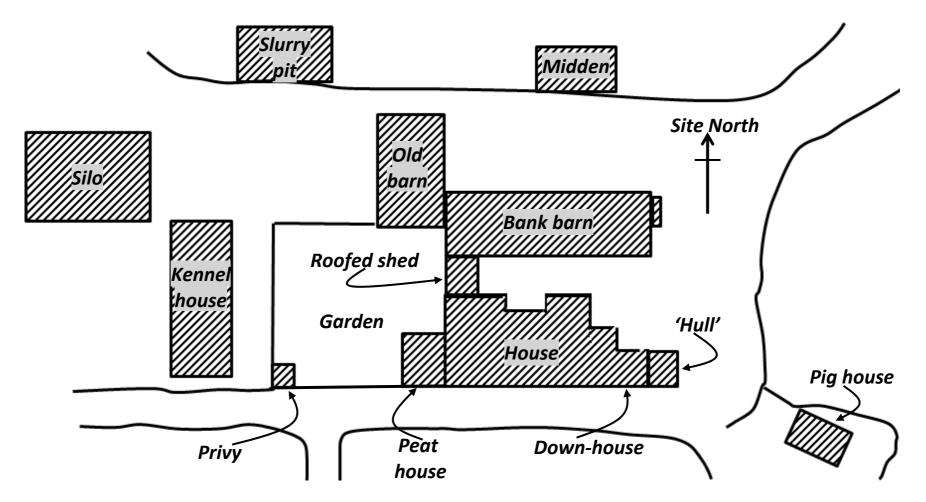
Plan to show layout and arrangement of the buildings at Row Ridding Farm (after Louise McArthur)
